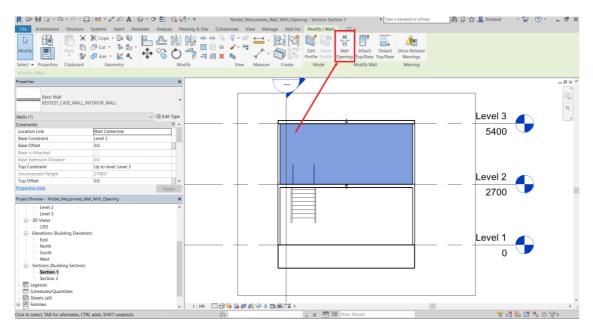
A SNAP SHOT SHOWING THE AUTODESK REVIT "WALL OPENING" TOOL (MODIFICATIONS IN RED)
